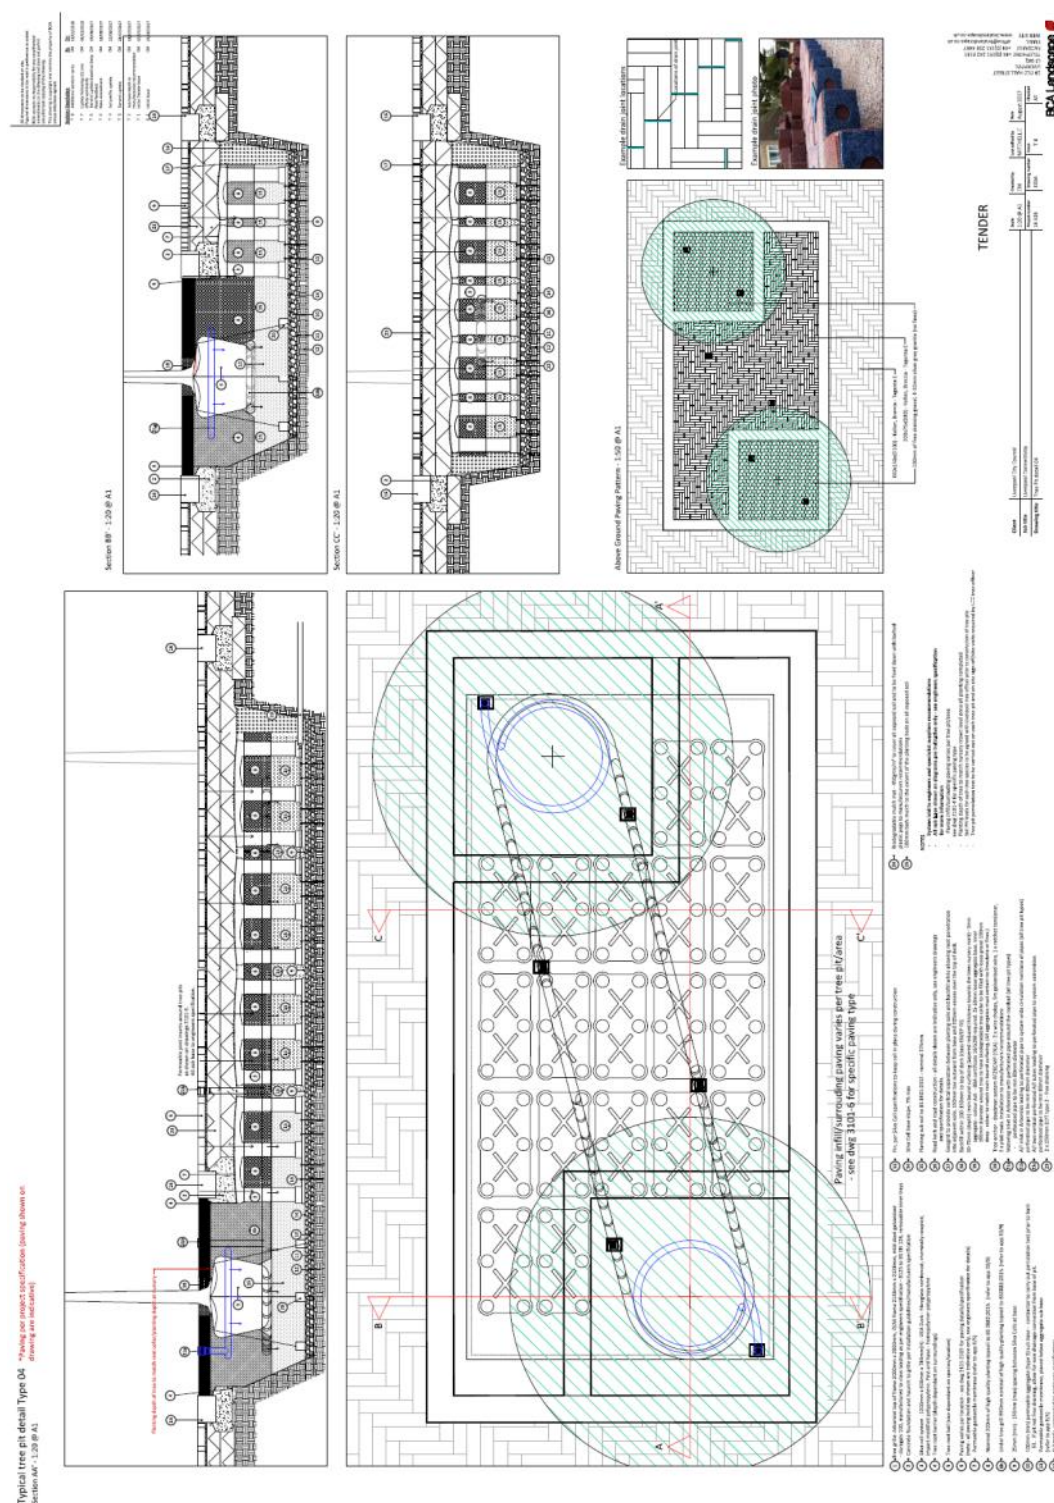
Sample of technical drawing for Urban GreenUP tree pit design with several trees in trench planting system
